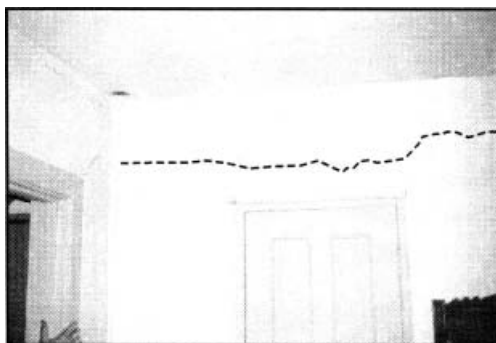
Horizontal crack in an upstairs bedroom. A horizontal crack was apparent in several locations at the base of the concrete bond beam (dotted line along crack).
